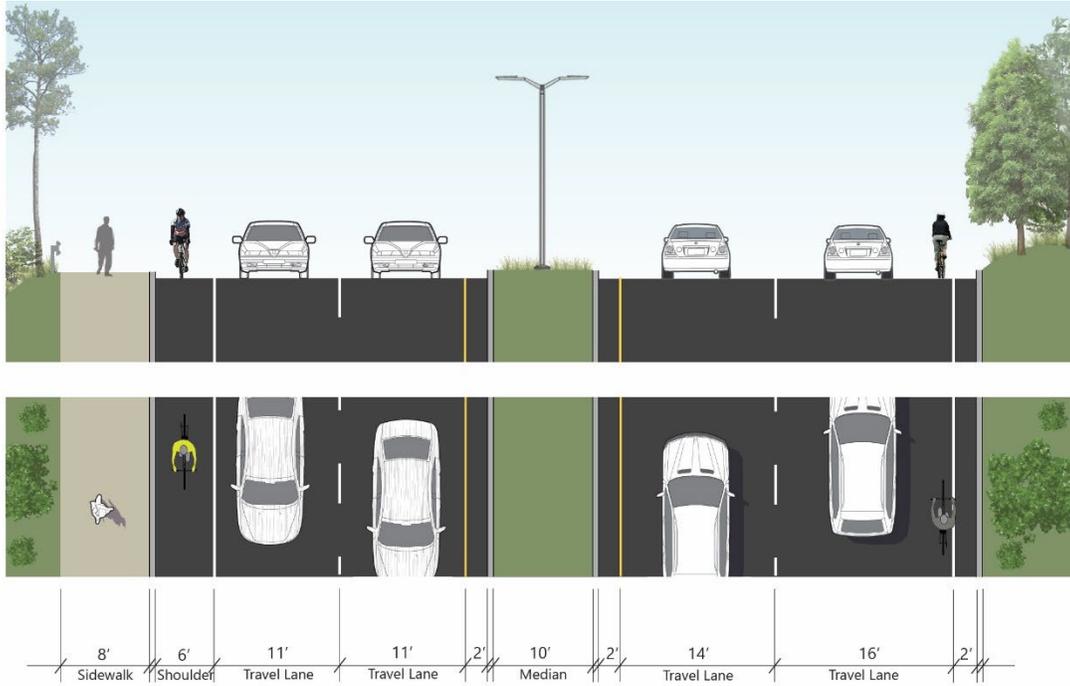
Section B-1: Existing Condition on South Street, facing east
